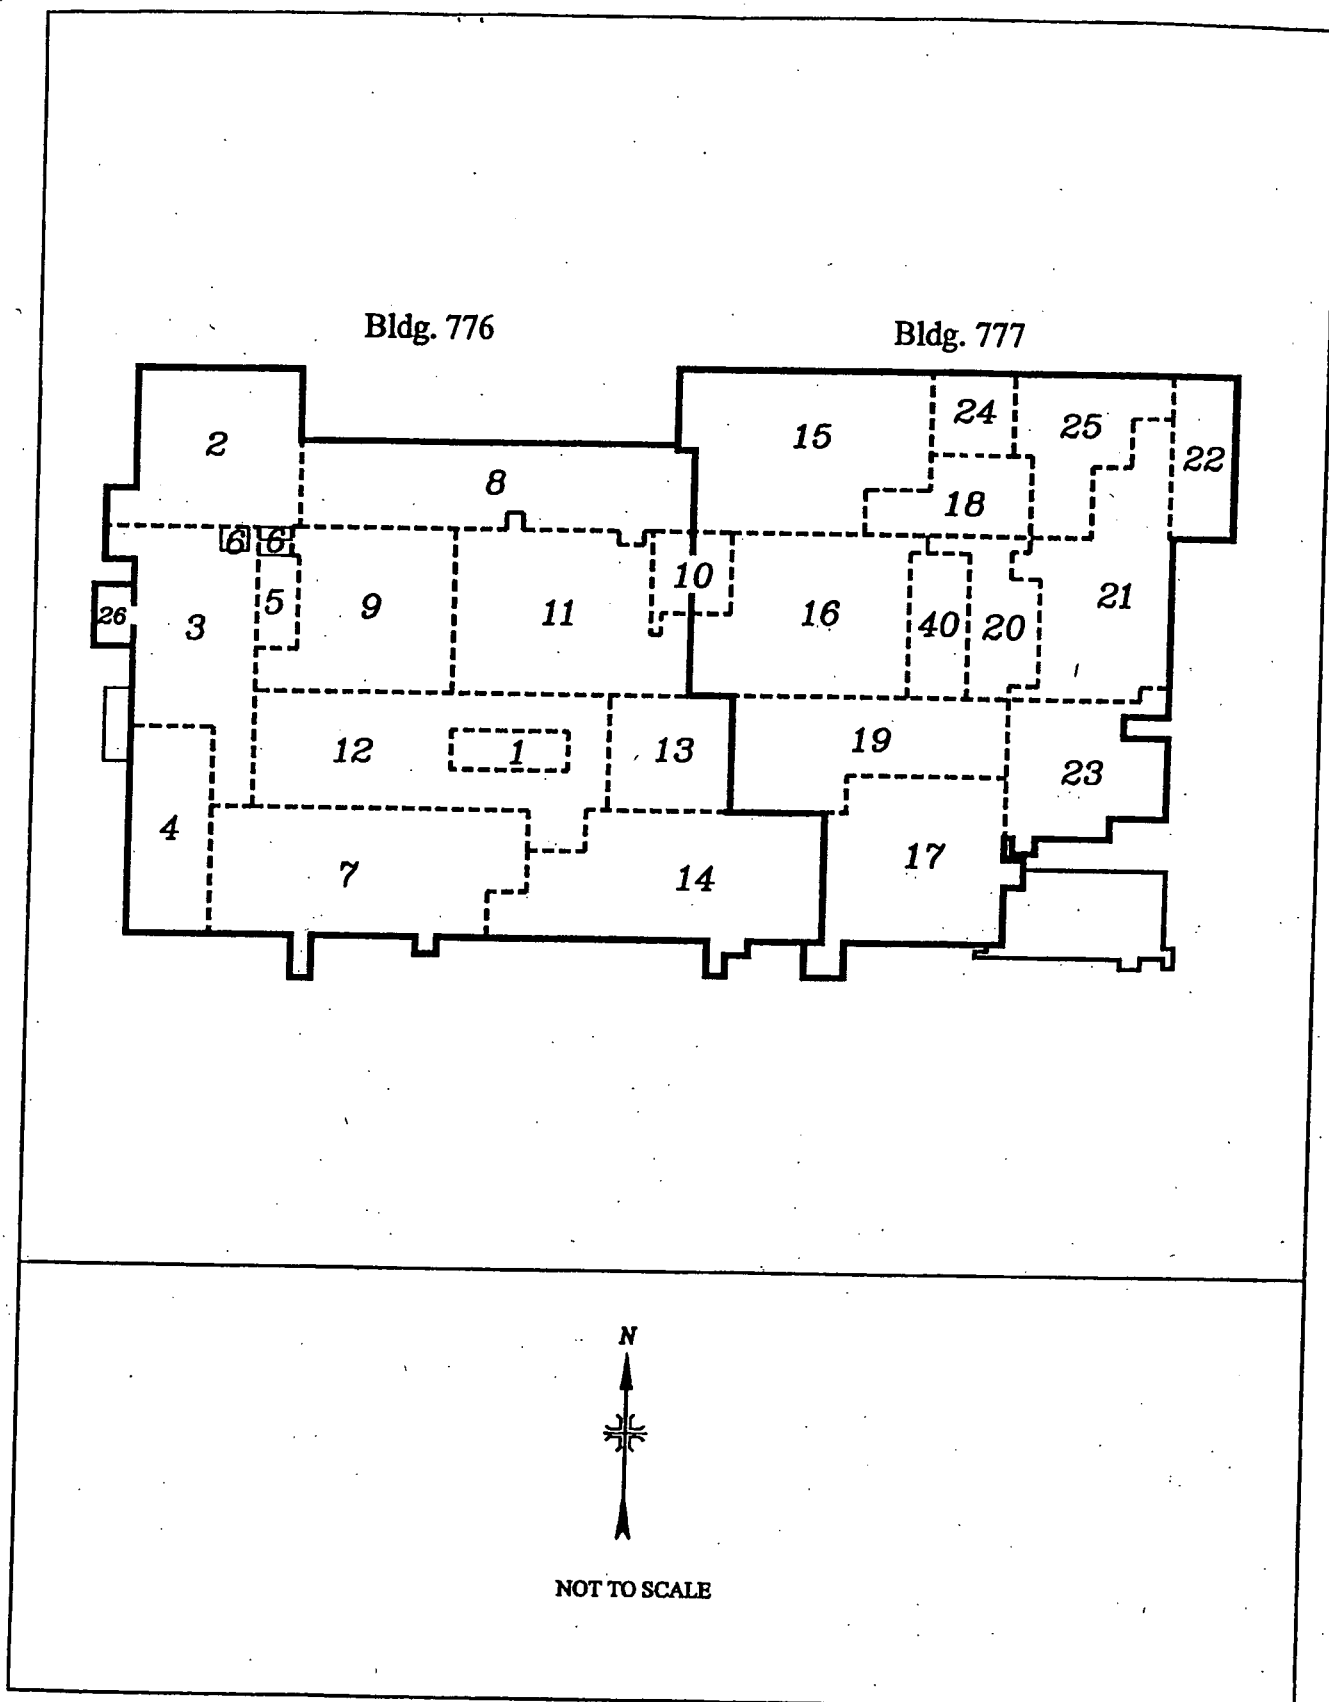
Rocky Flats, Building 776/777 - Plot Plan
